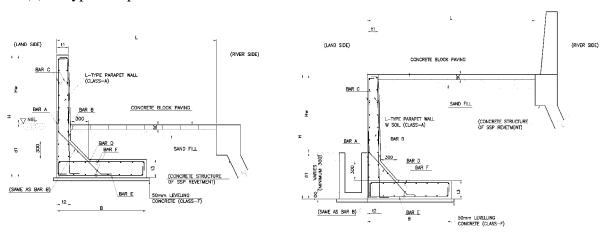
Typical Cross Section of Inclined Wall
